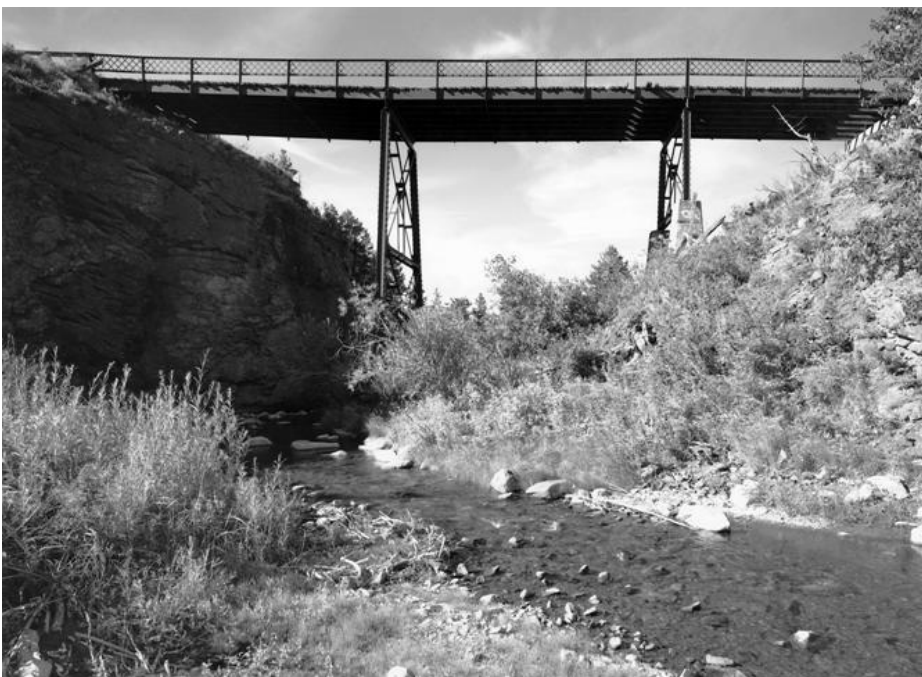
Shonkin Creek Bridge. South profile. View to the north
